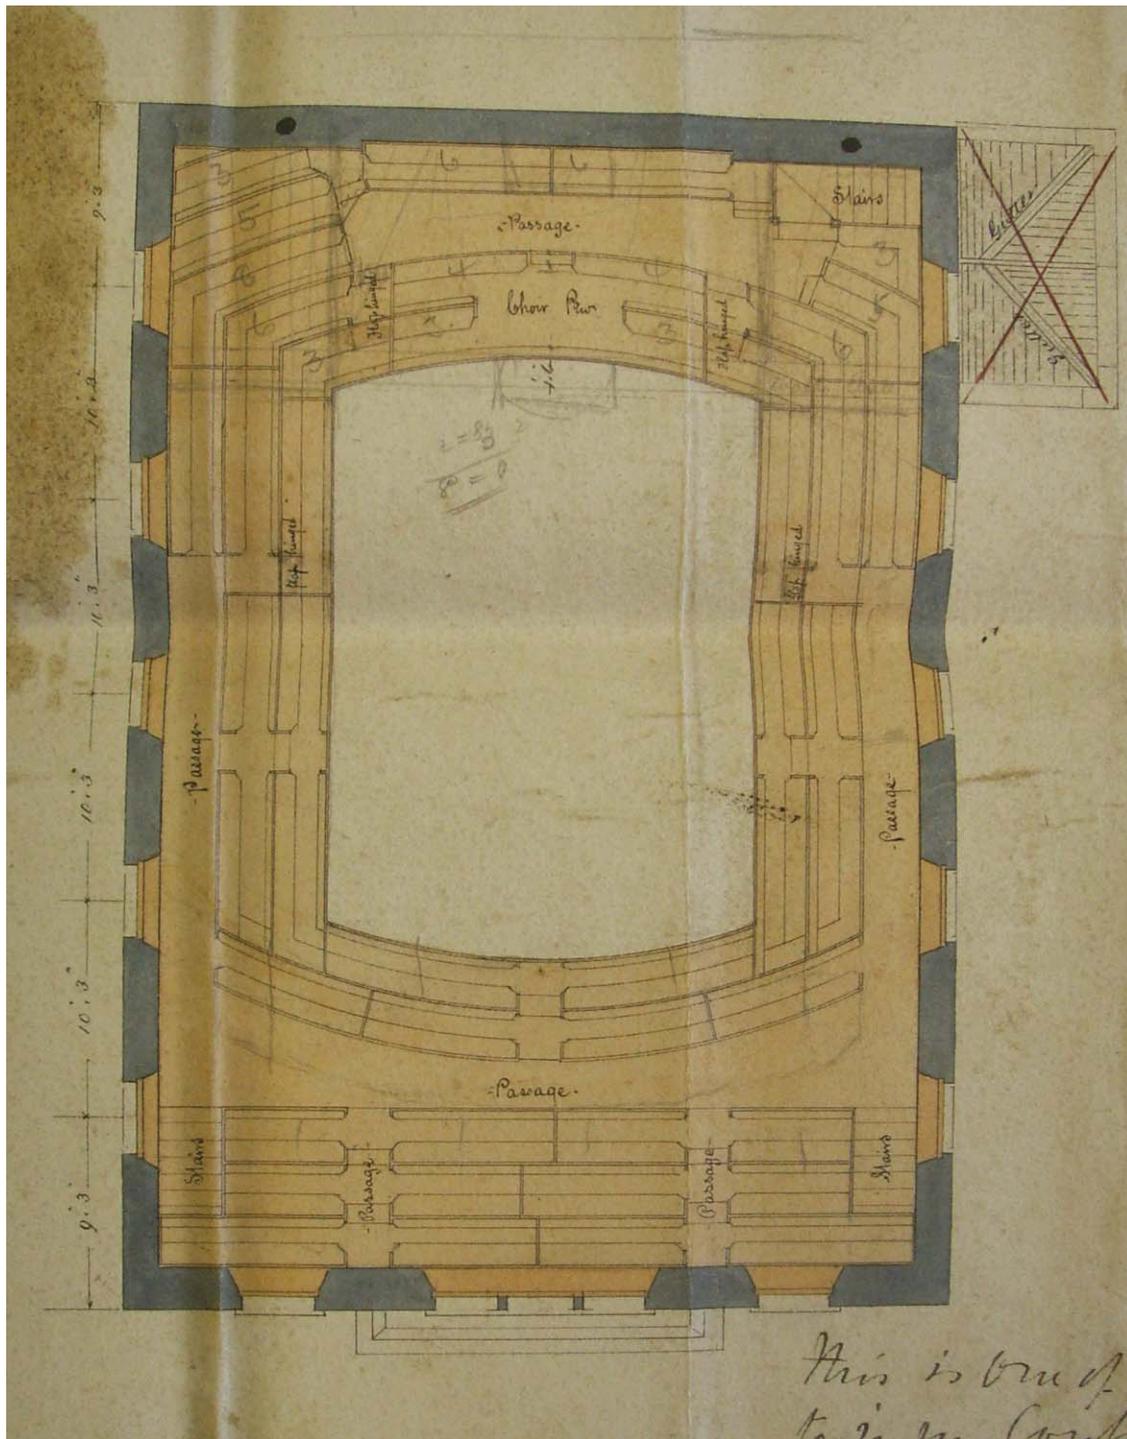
First floor plan as proposed in original drawings of 1872 (CRO(B) Z1099 1872)
